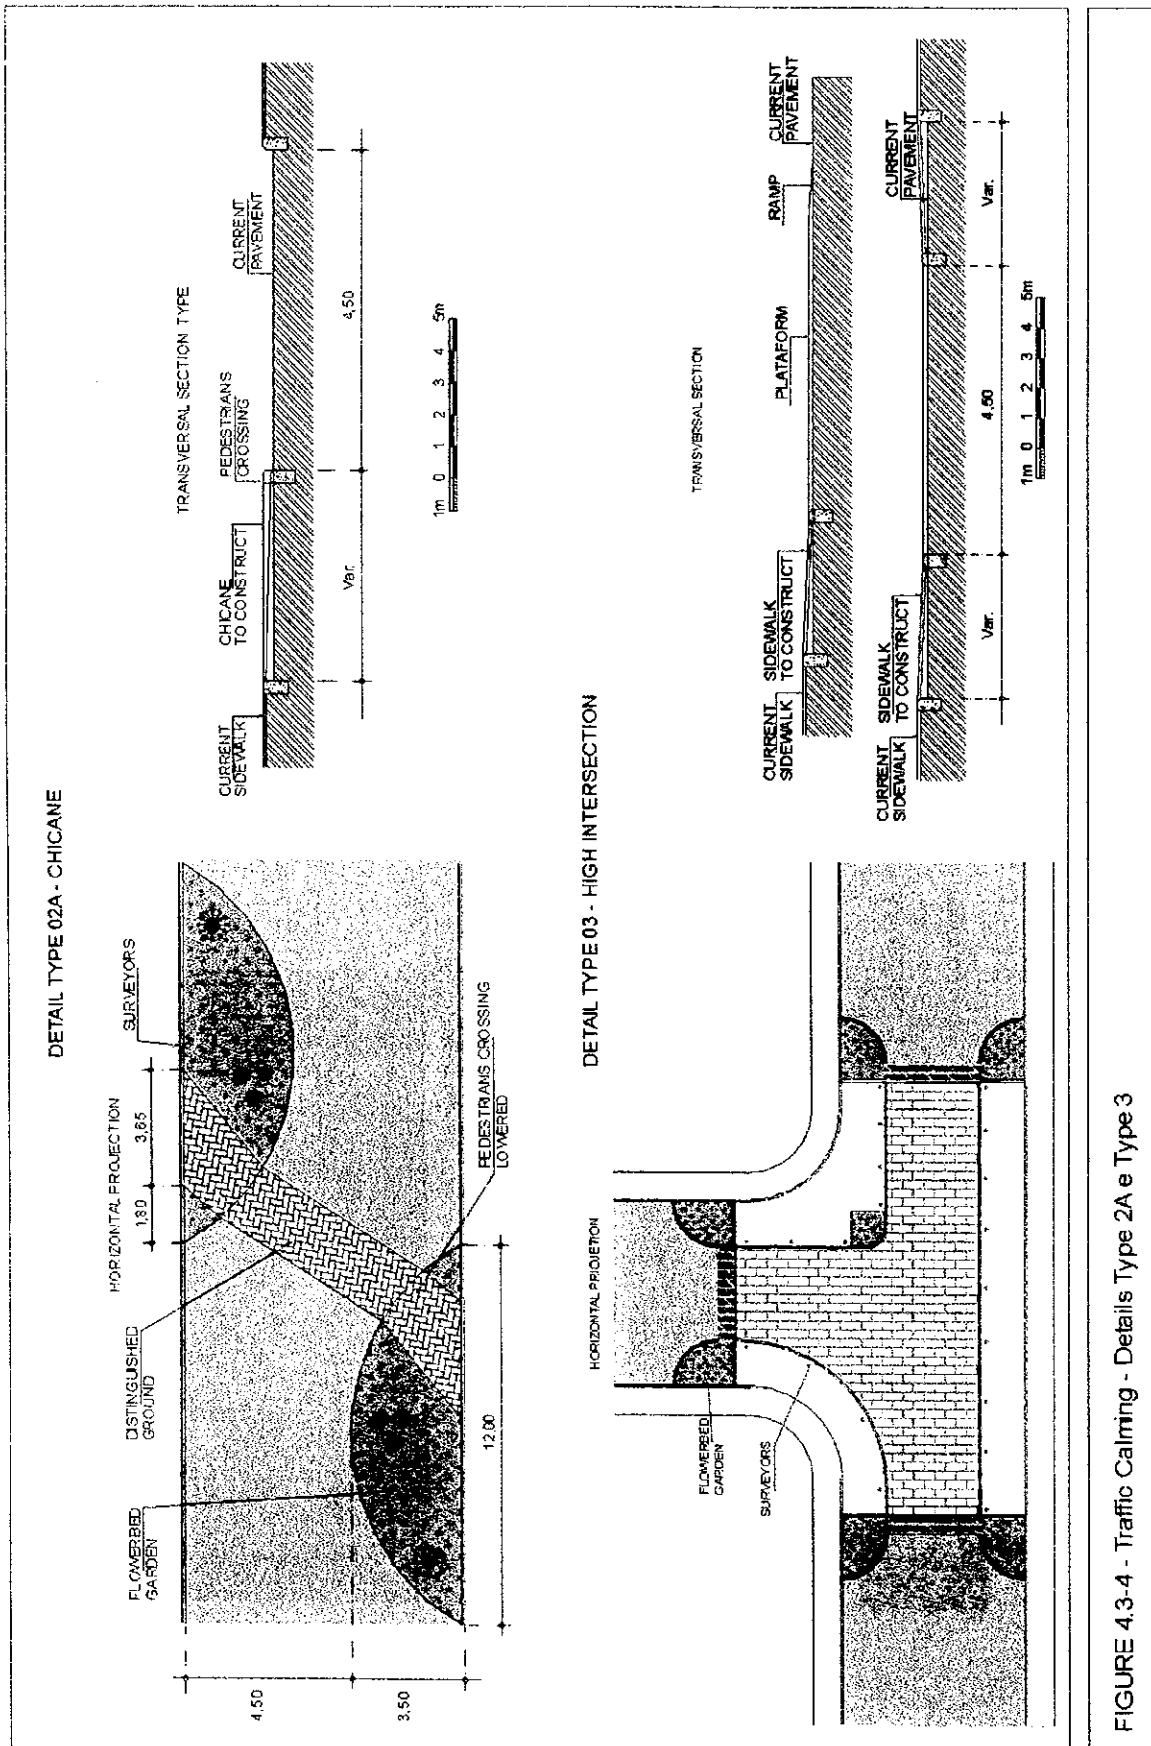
Traffic Calming - Details Type 2A e Type 3
